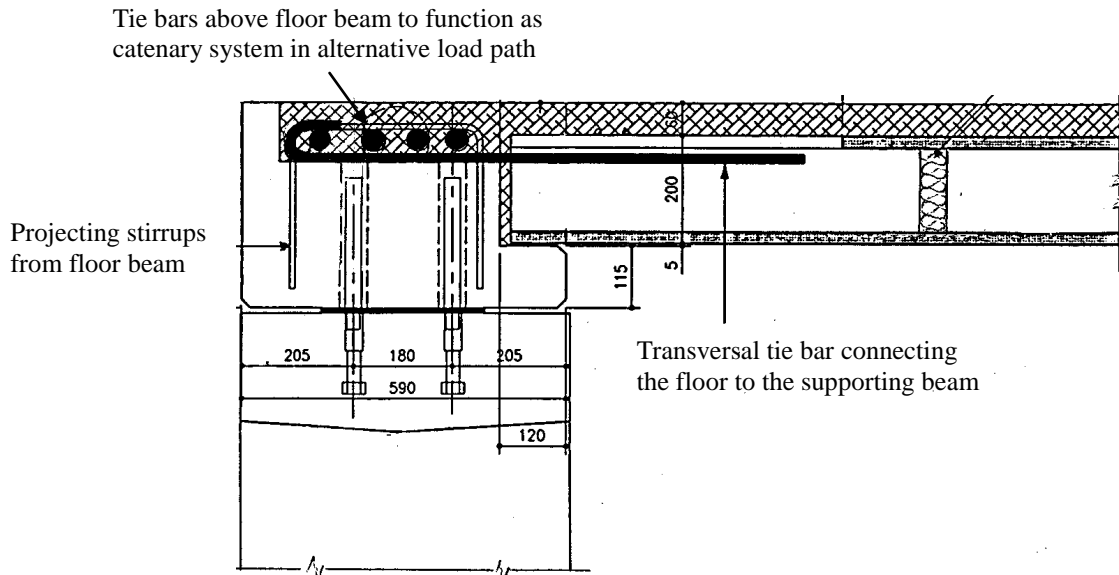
Example of connection between floor beam and peripheral tie reinforcement
